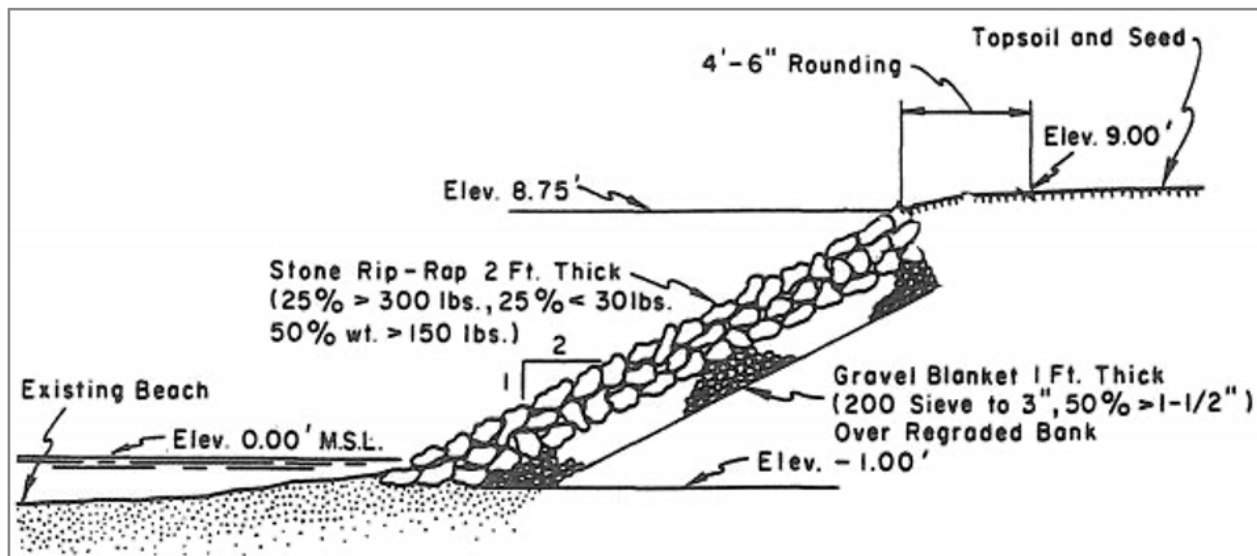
Rock Rip Rap Schematic Cross Section (Source: EPA)
